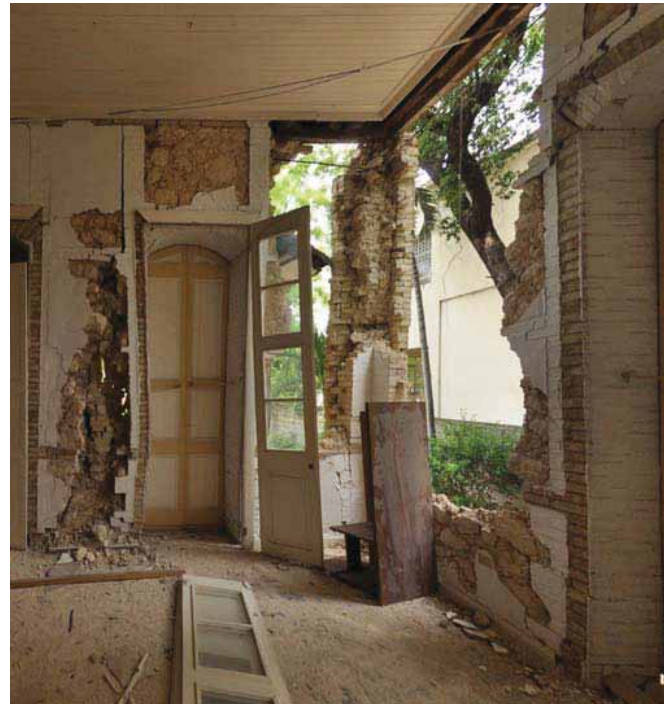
above left* The Dufort House showing the collapse of the rubble panels, leaving the piers standing holding up the almost undamaged upper floor structure. The remarkably large pile in front shows the volume of rubble masonry removed from the house after it had collapsed. *above right* The interior of the Dufort House, also shown in Figure 77, showing how the collapse of the rubble panels left the house standing on the brick piers which were left like free standing columns. *left* This house also had steel or wrought iron reinforcing chains made up of rods hooked together for the full length of the exterior and major interior walls. In this case, rather than exterior plates to hold them, their wall anchors were imbedded under the outer wythe of masonry. The rods are also visible where they intersect at the corner pier that is still standing, which can be most clearly seen in Figure 93.
